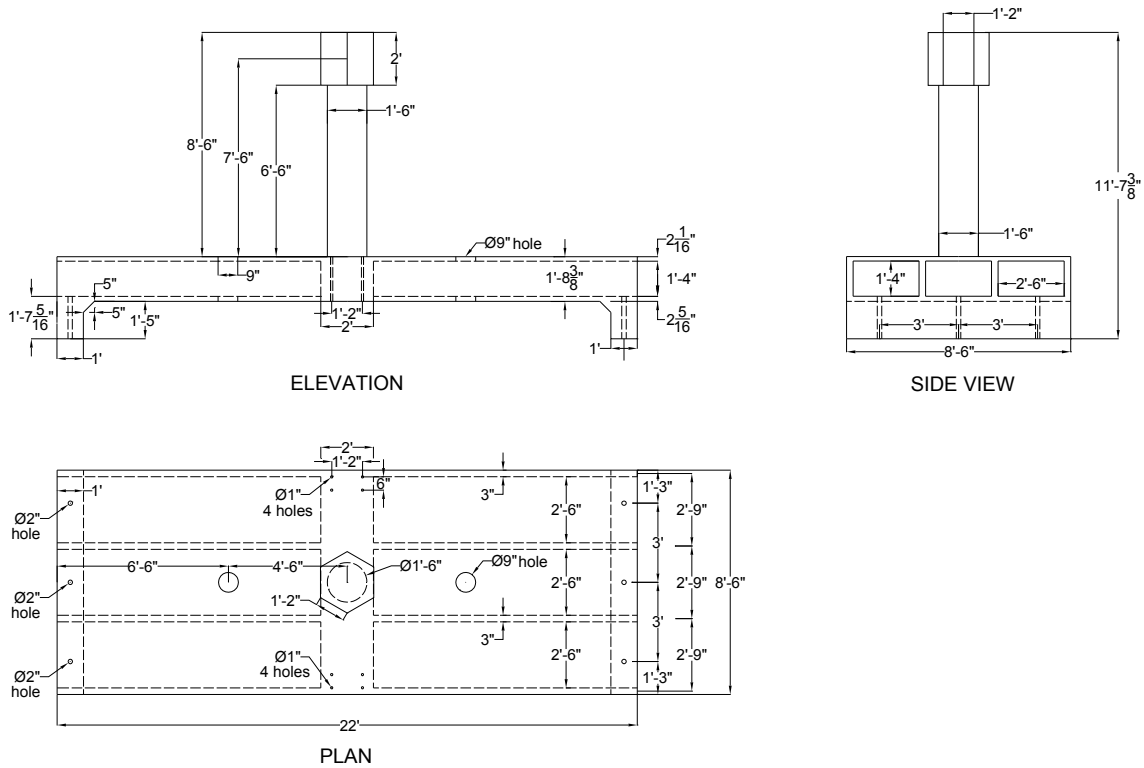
Different views of the 1/4-scale subassembly specimen
